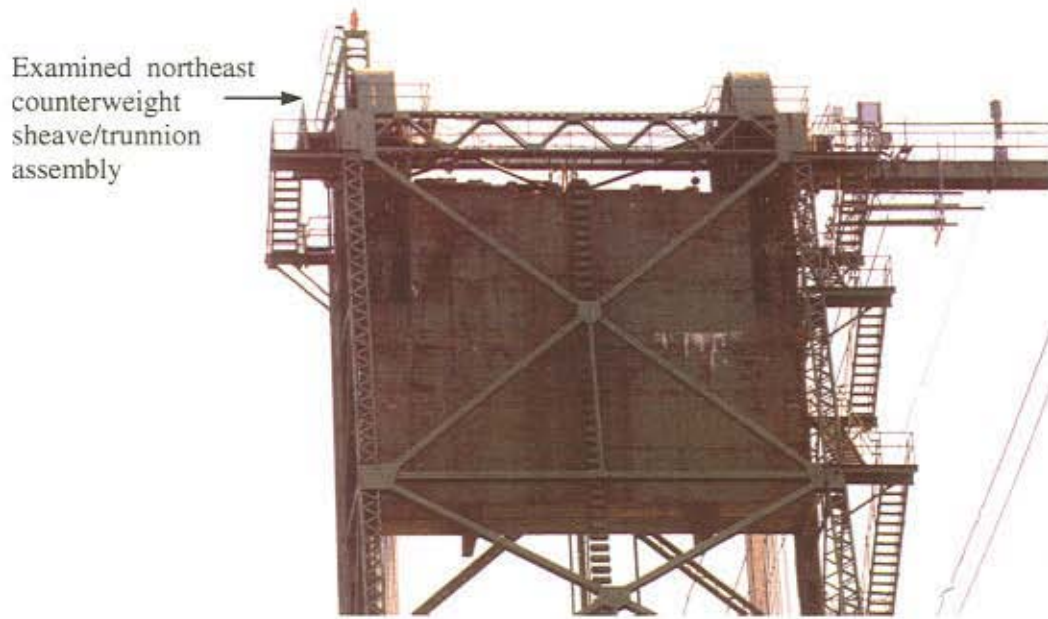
North tower of 1917 lift span structure showing counterweight sheave/trunnion assemblies
